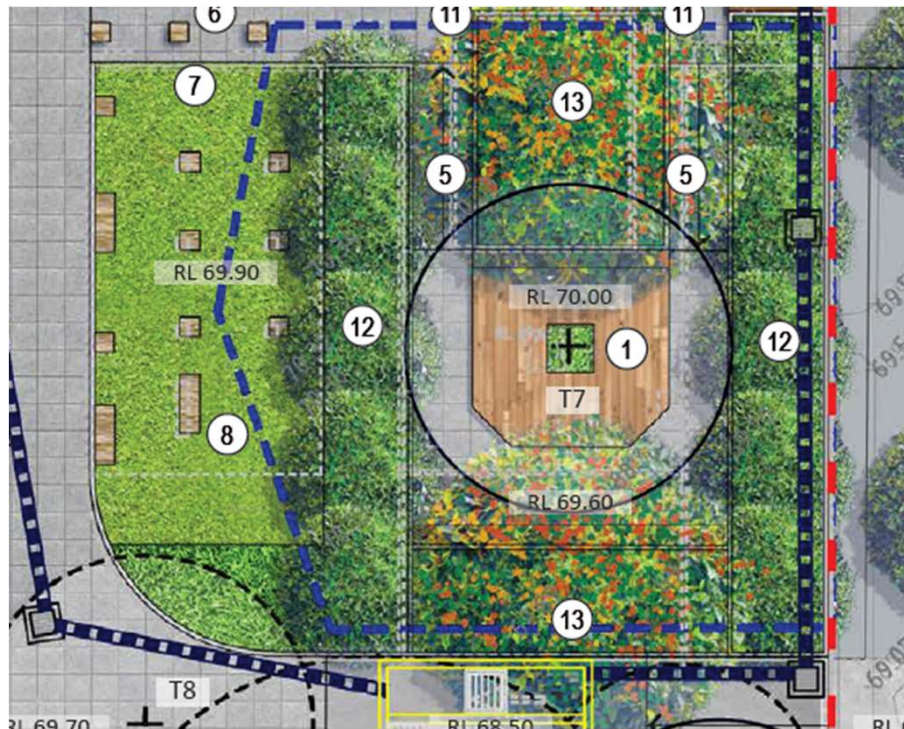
Ground floor plan with Hotham House and alternate driveway overlaid.
